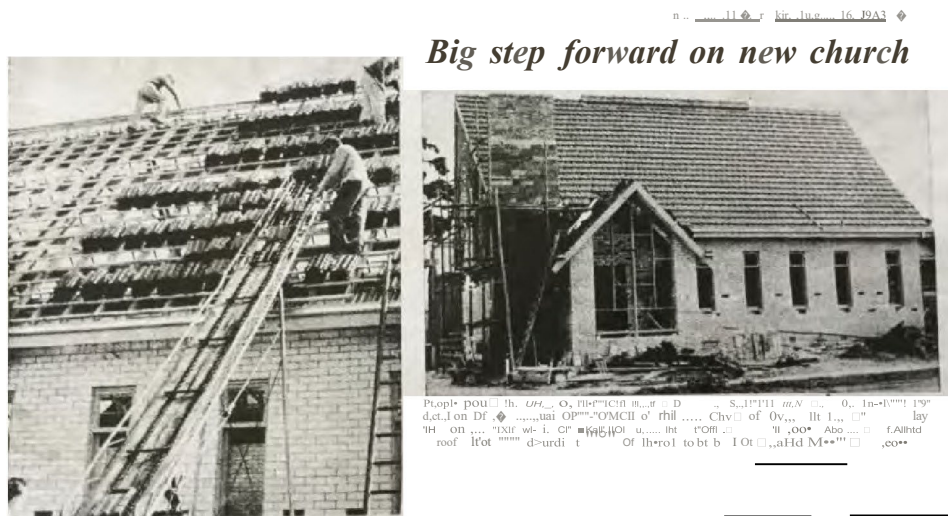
An extract from The Advertiser newspaper showing the construction of the front cream brick section of Church of Christ. *Source:* Unknown. n.d. *Earliest memories of M-Church*. Digitised photograph. Maryborough Church of Christ (website). Accessed September 2023. <https://www.mchurch.org.au/our-history.html>.
